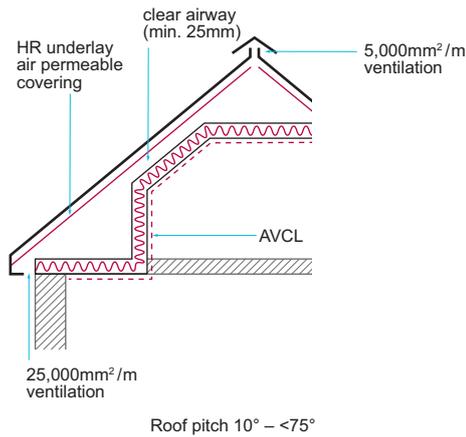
Hybrid roof - Room in roof (flat roof dormer)
